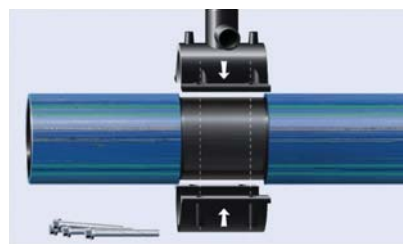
Mounting the tapping fitting according to the manufacturer's installation instructions
